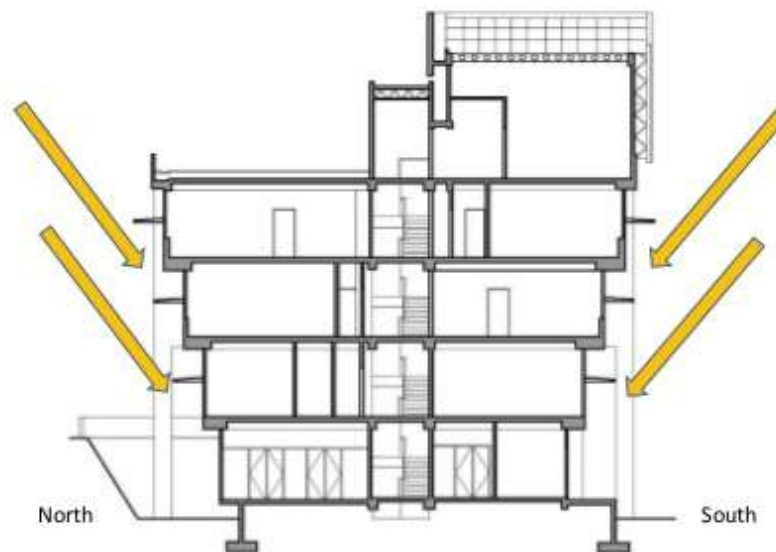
Section (<http://www.greenbuildingindex.org/why-green-buildings.html>)
